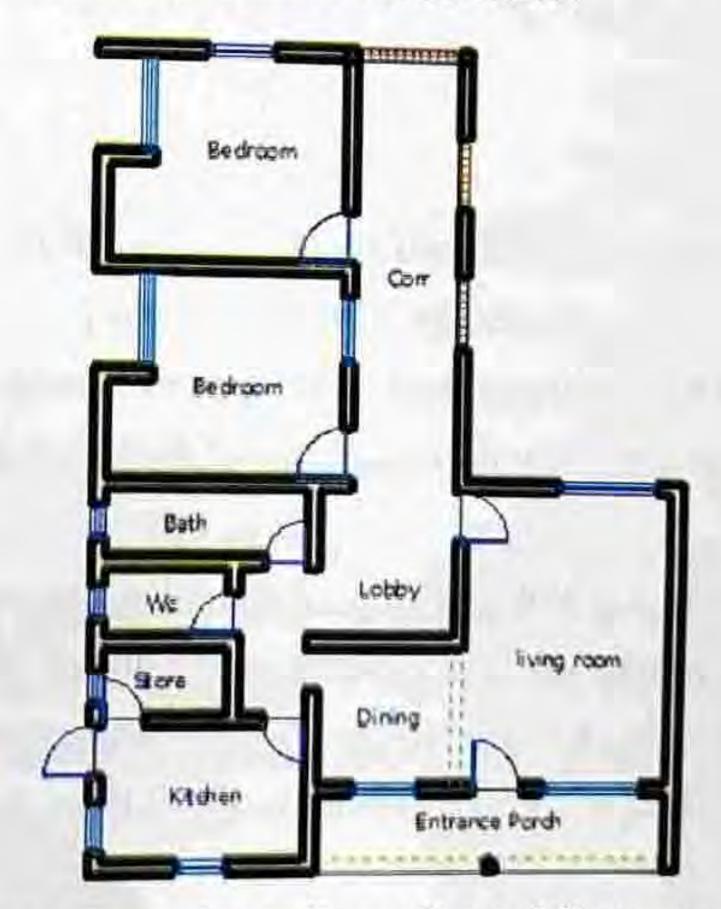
A typical 2 bedroom floor plan at Bosso Estate Minna:source authors survey 2011
